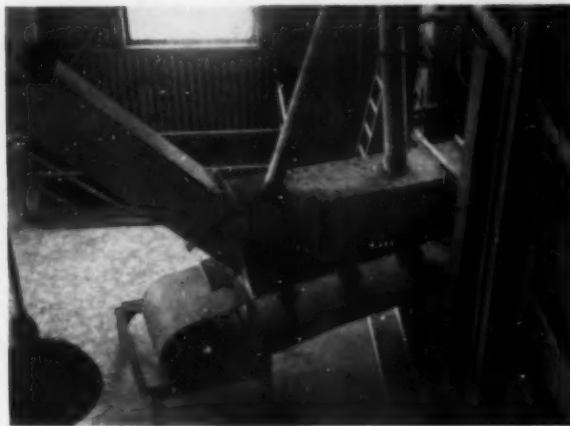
Feeder for 30-in. conveyor belt to stone storage. Note pipe (left) for dust from collector and dust collector intake at right in the illustration
